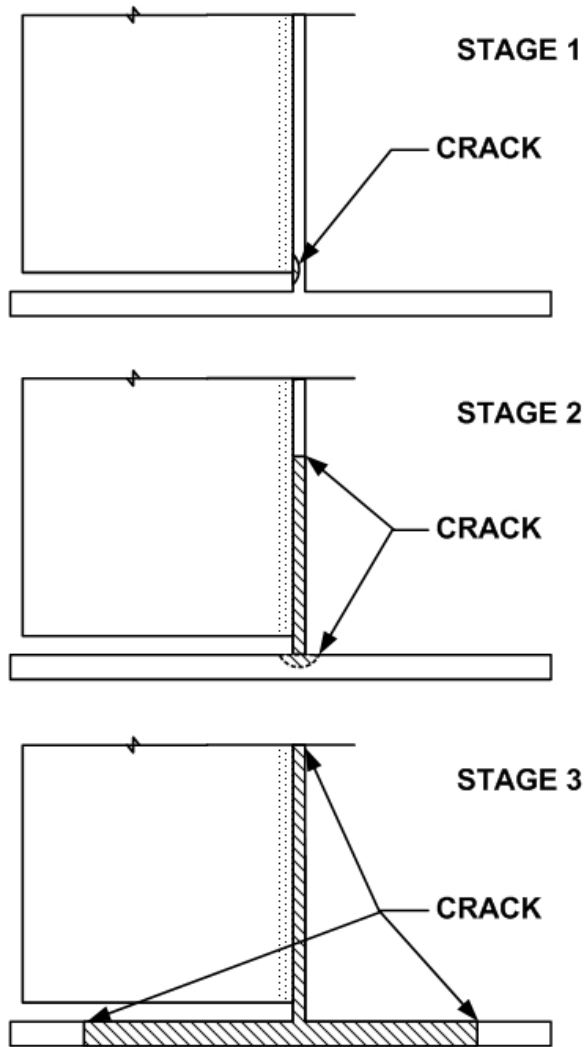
Crack Growth at Transverse Stiffener Welded to Web
